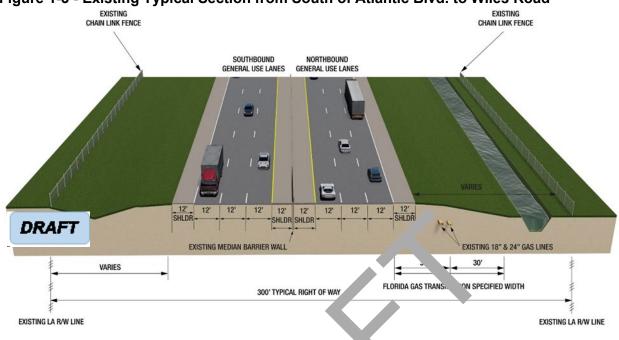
Existing Typical Section from South of Atlantic Blvd. to Wiles Road
